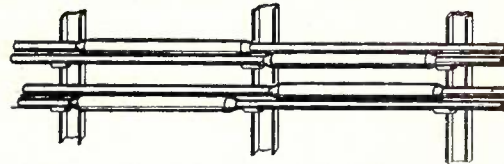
Showing staggered arrangement of Joints on wall of Manhole permitting the use of Slip Sleeves.
